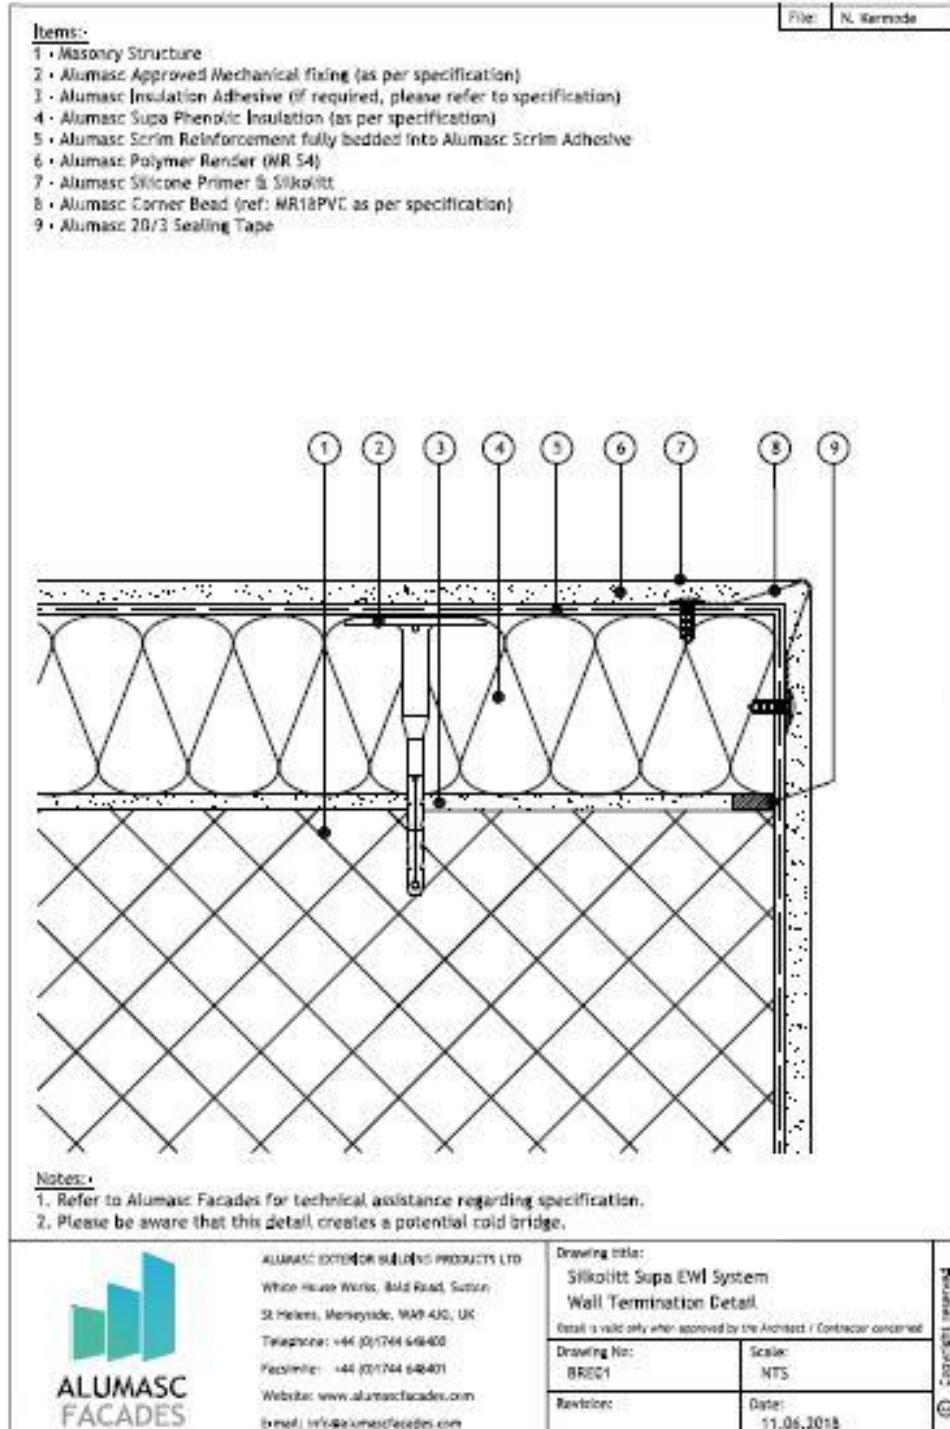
Cross-section: corner detail (supplied by Test Sponsor).
